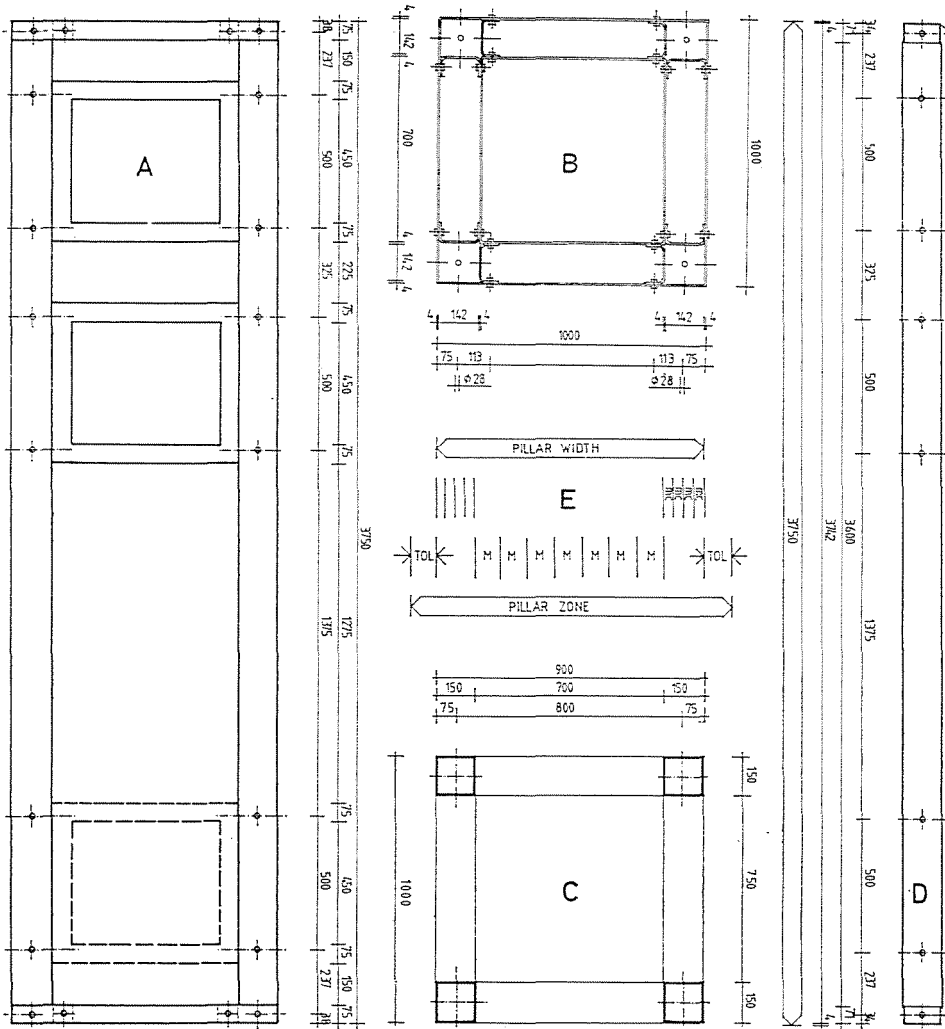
The lift-cell building method: the heterogeneous pillar skeleton frame. A. Elevation; B. Horizontal section through cradle; C. Horizontal section through jointing points embedded into r.c. column; D. Vertical section through diaphragms; E. The zone of tolerance around pillars: the module grid and the micro grid on plan. The heterogeneous pillar skeleton-frame—again a small box-unit of parameter size in one direction—arises in such a way that we couple the column elements—that is the manufactured tectonic linear r.c. structural elements—in fours by means of steel cradles and diaphragms, whereby we unite them into empty pillar skeleton-frames
